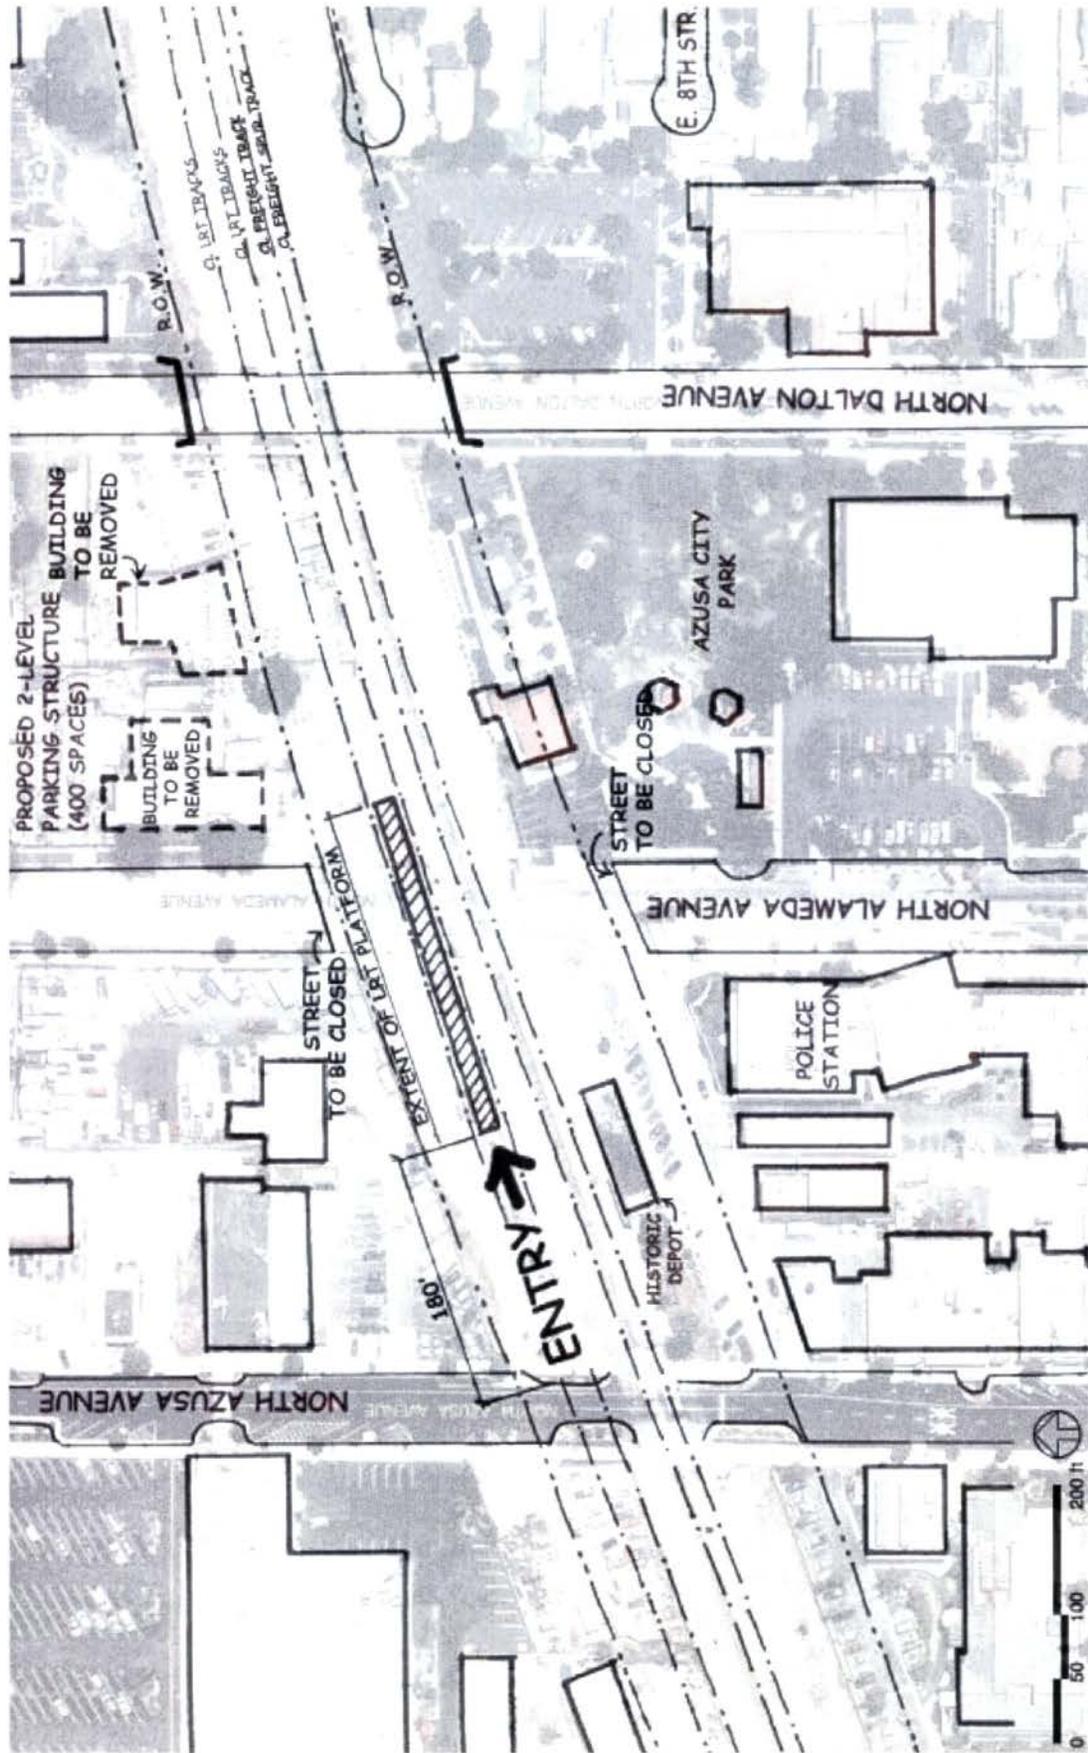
Site Plan: City of Azusa, Alameda Avenue Station
